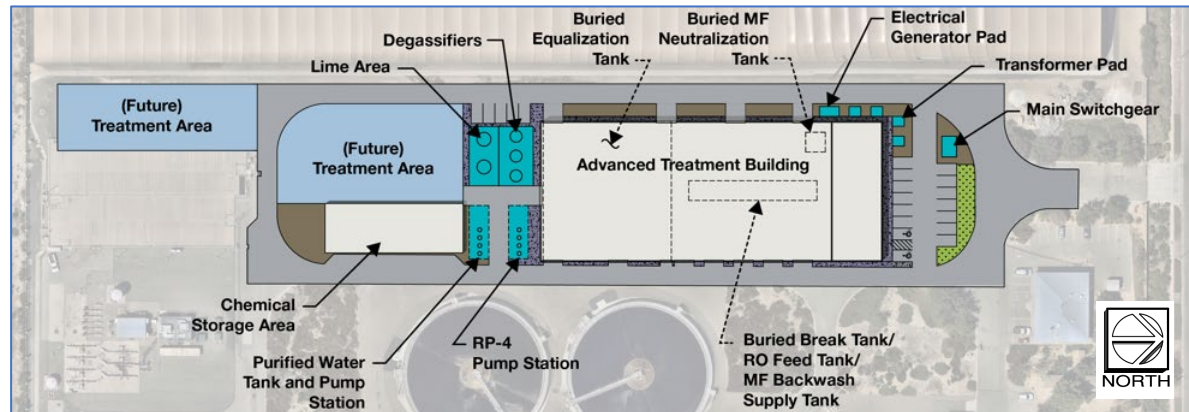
Proposed Advanced Water Purification Facility (AWPF) site layout
